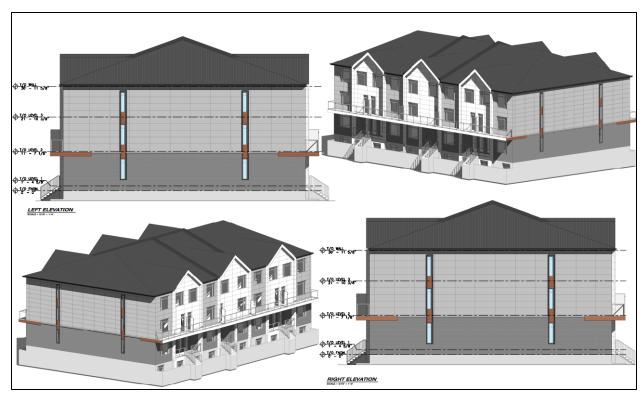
Renderings left and right elevation of proposed stacked townhouse development at 1467 Wharncliffe Road South.
